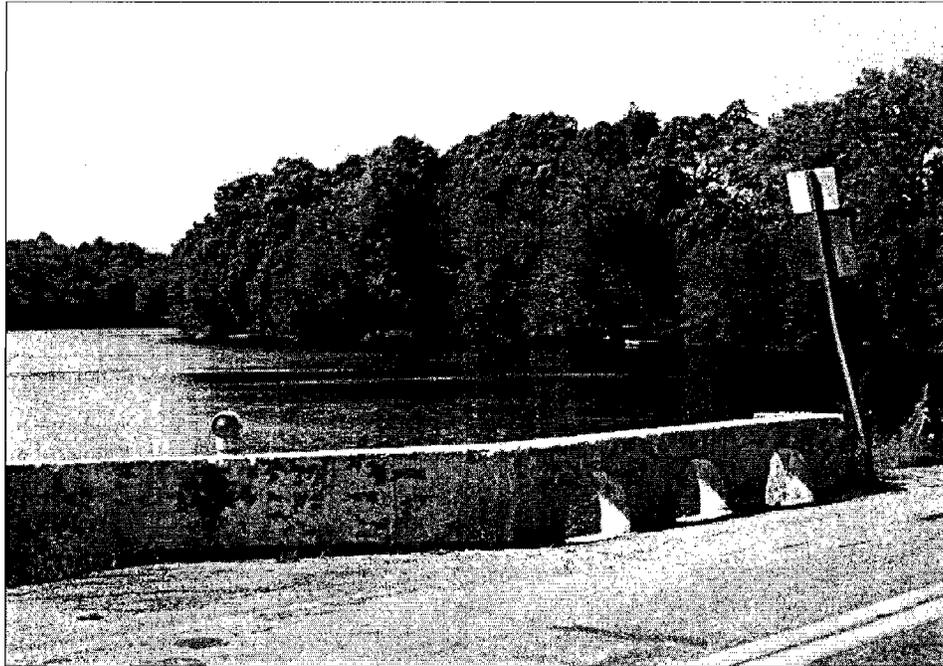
View of Bridge 3-806’s Parapet Wall (South) at Diamond Pond (9/2002)
